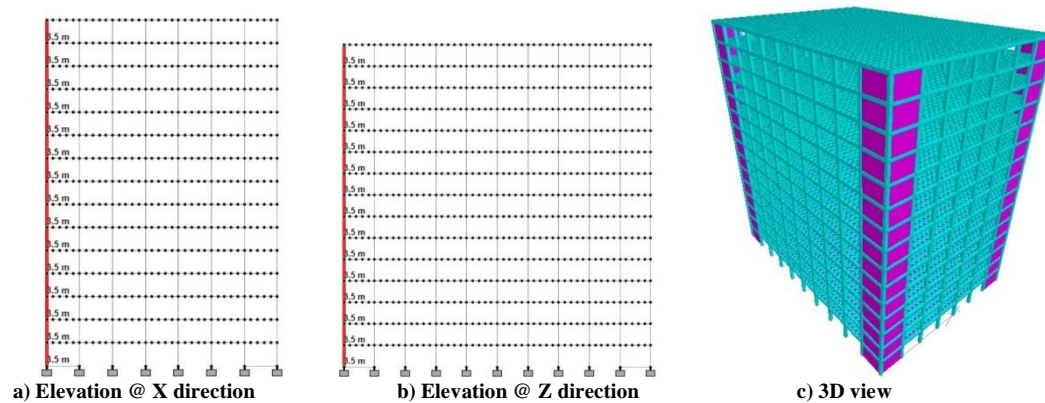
Model 2- G+14 Storey Building with Flat slab system having L-type shear wall.
